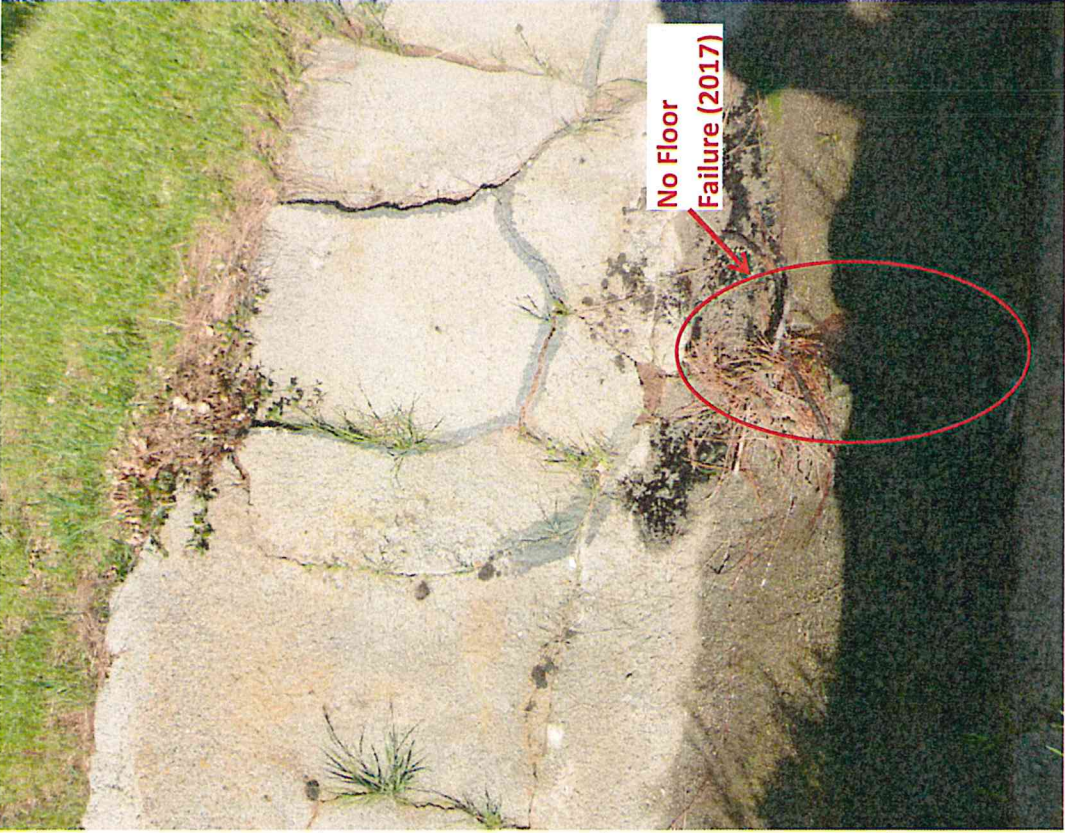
Lower Flume, Upper Section Pre-Floor Failure, 2017
